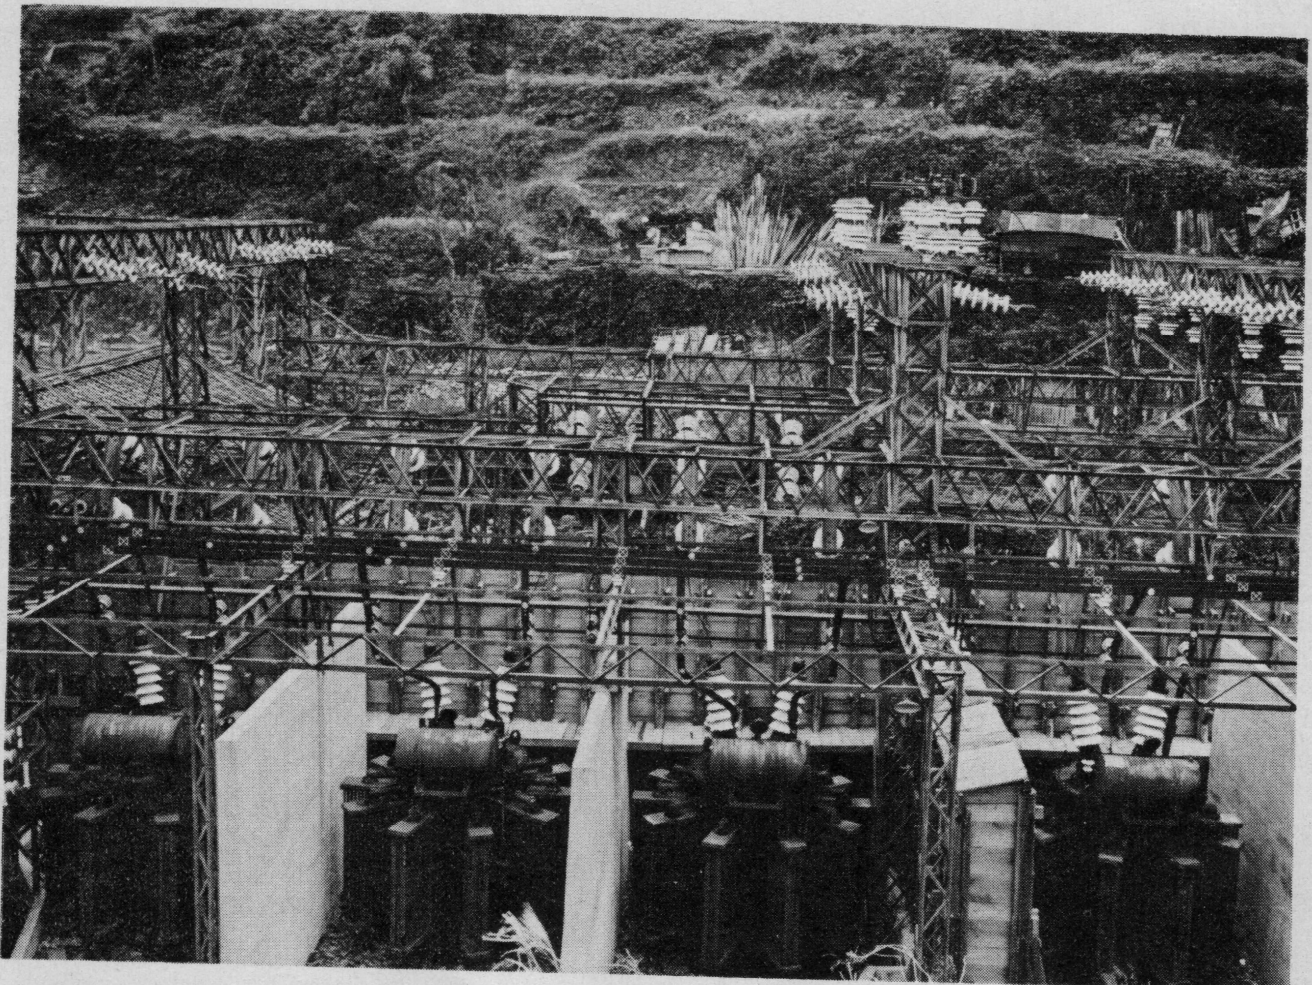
Reinforced-concrete blast walls protecting transformers (1 mile from ground zero at Nagasaki).
